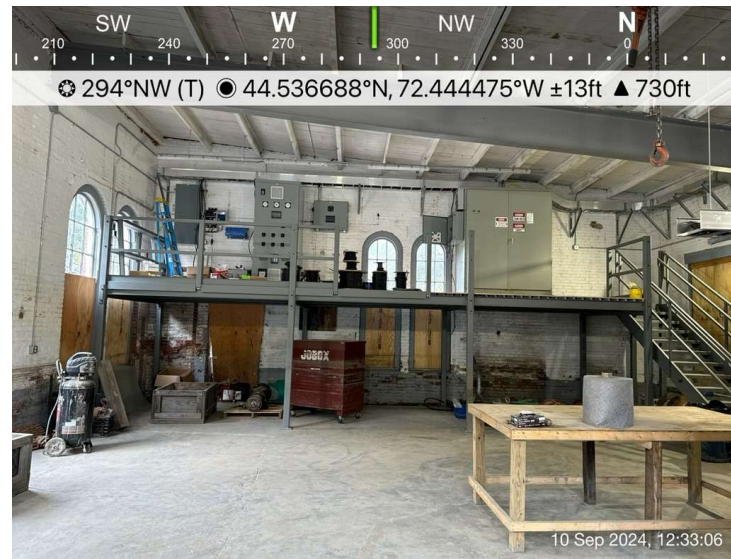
Interior west elevation showing newer mezzanine to elevate generator controls and electrical panels flood damaged in 2023
